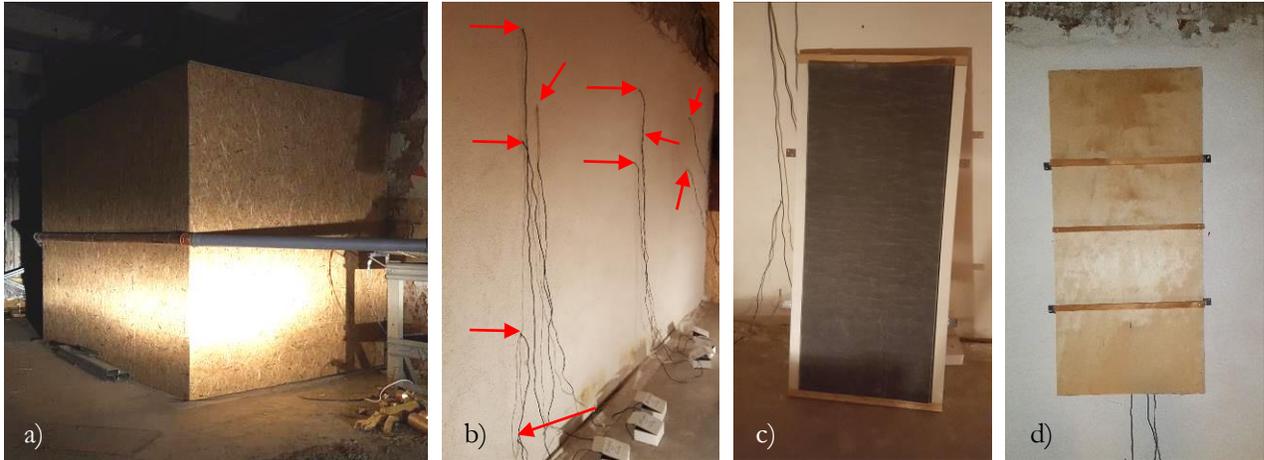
(a) Small test room inside the building, (b) Hygrothermal sensors (marked with arrows) in the brick in the plastered brick wall, (c) AB insulated panel (removable for inspection of the wall), (d) Installed AB and VIP panel.
